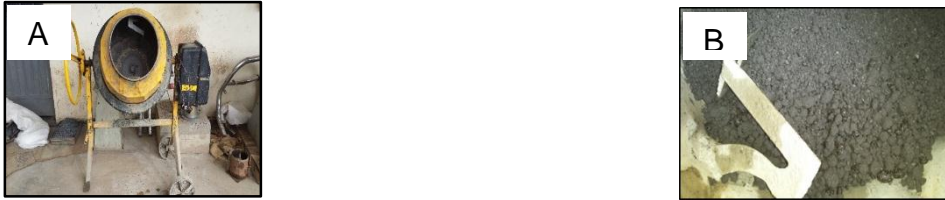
Soil and stabilizer mixing with mechanical mixer. (a) Mechanical mixer and (b) clumping of soils and stabilizers
